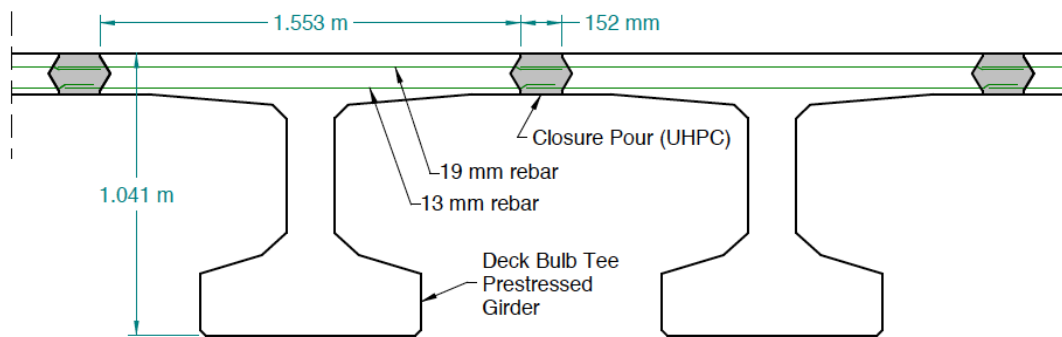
Cross-Sectional View of State Route 31 Bridge, Lyons, New York (Graybeal 2009).
